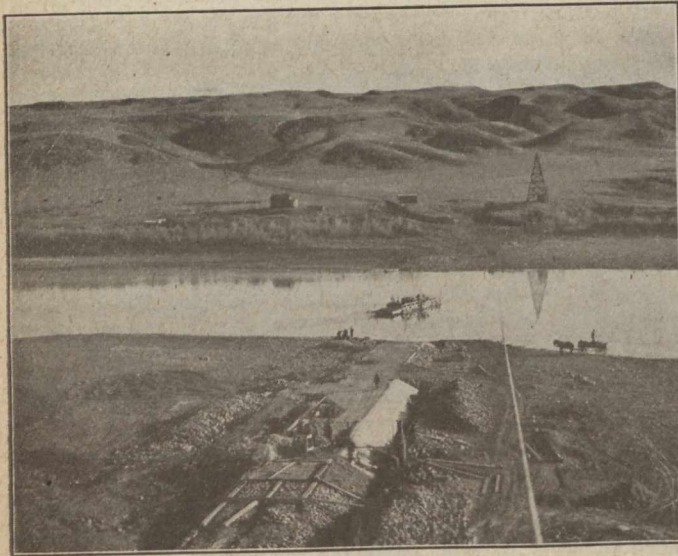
CONSTRUCTING PERMANENT APPROACH TO FERRY
